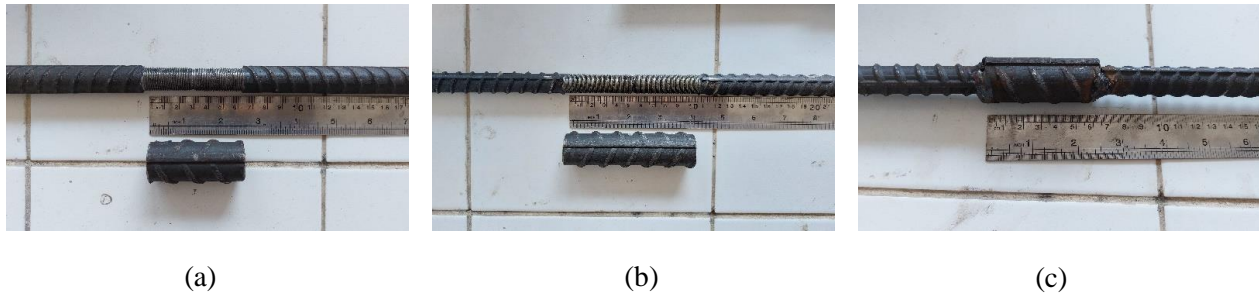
(a) compact sleeve, (b) long sleeve, (c) compact sleeve with additional welding at both ends of the coupler
